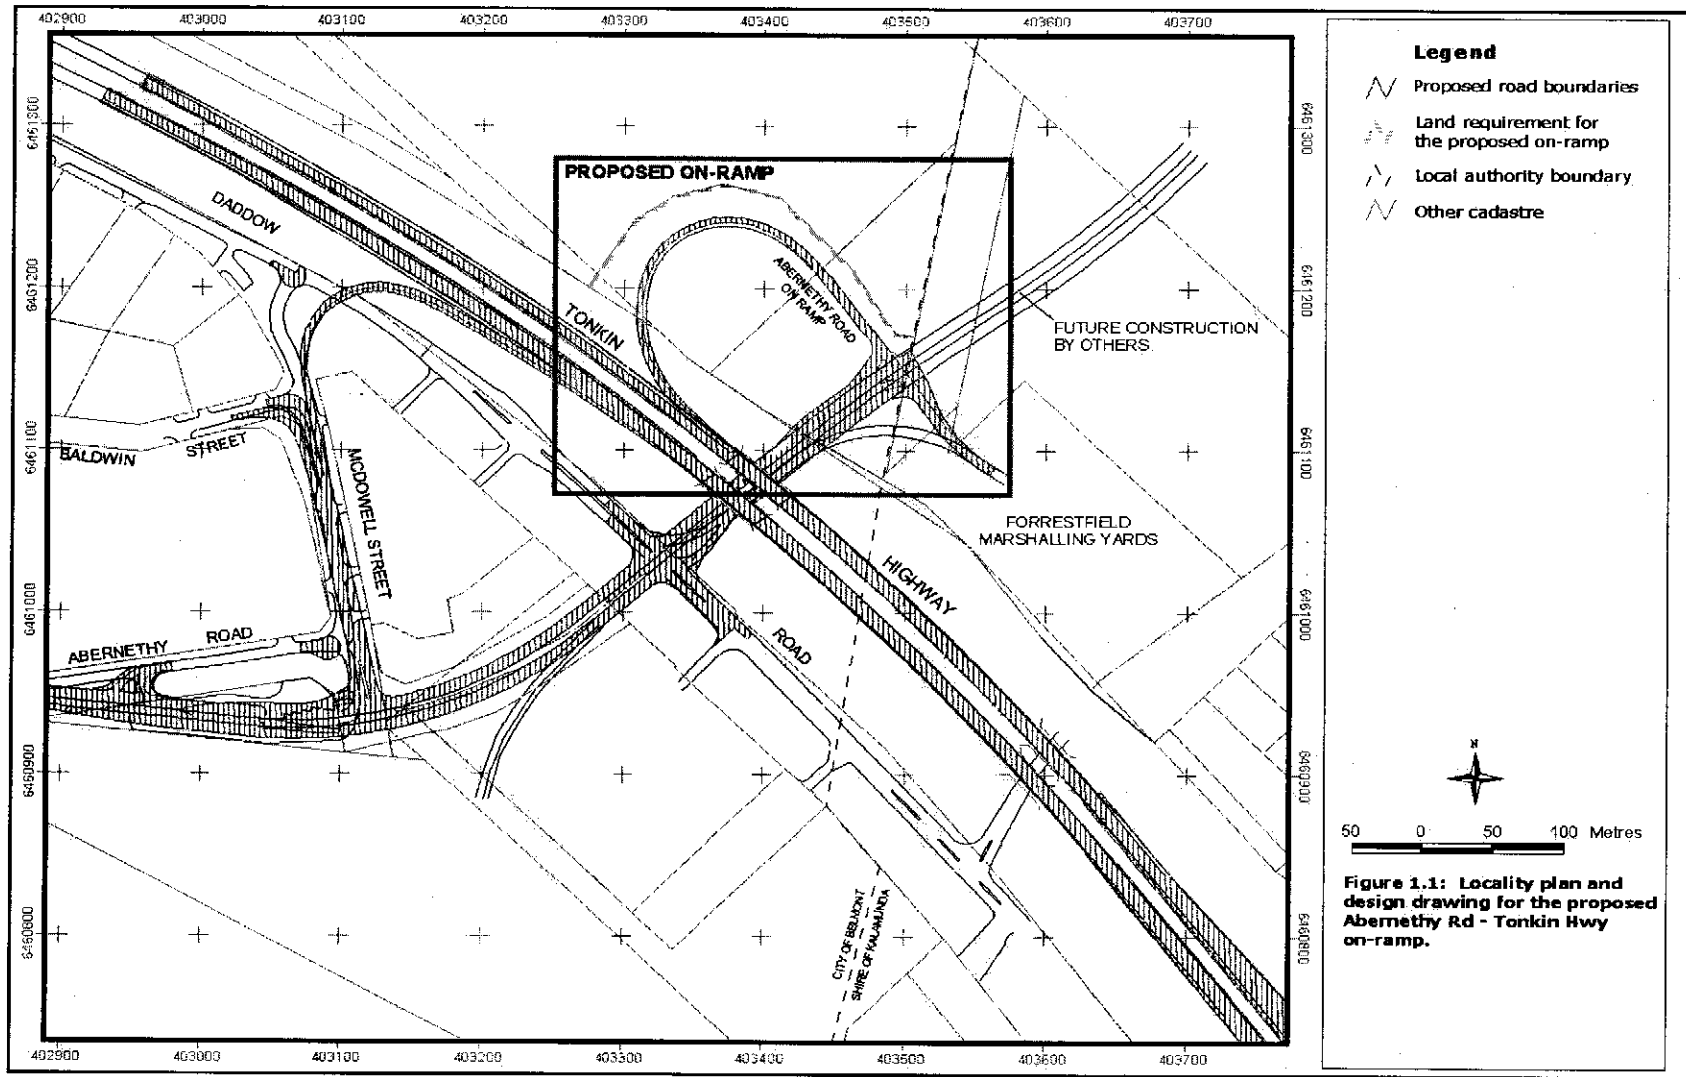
Proposed Abernethy Road-Tonkin Highway On-ramp
